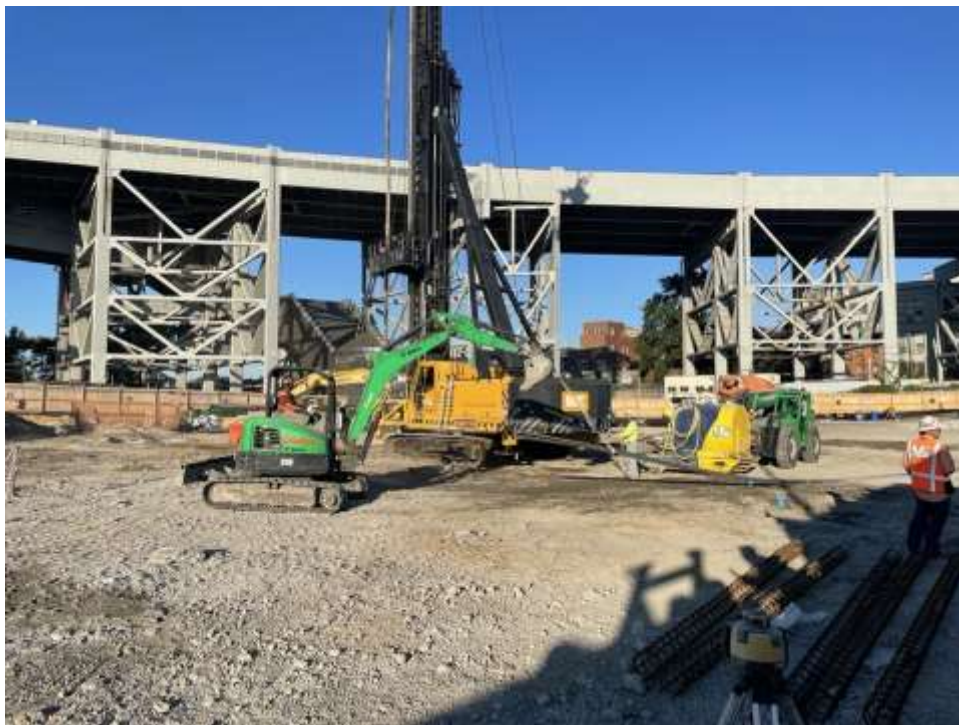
Morris-Shea advancing piles in the central part of the site (facing west).
